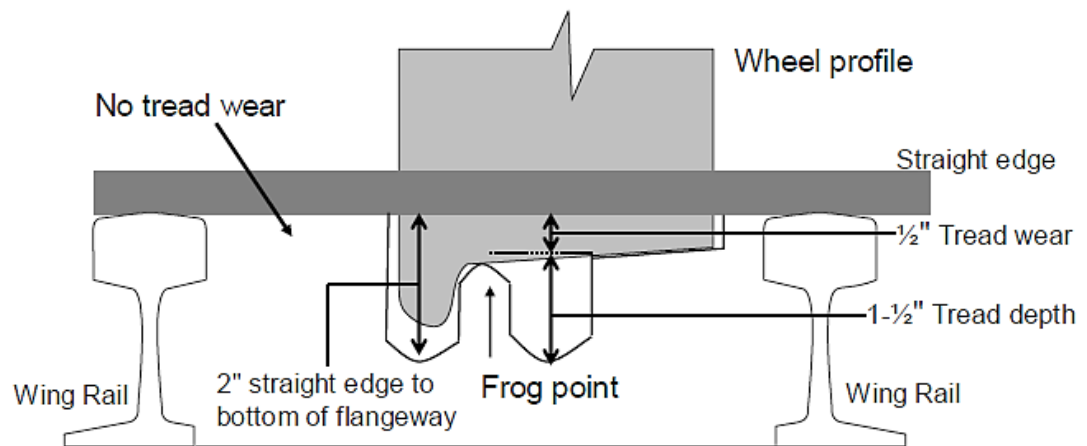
Figure SUB-PART D – 82 – Flangeway Depth Measurement with a Straight Edge
